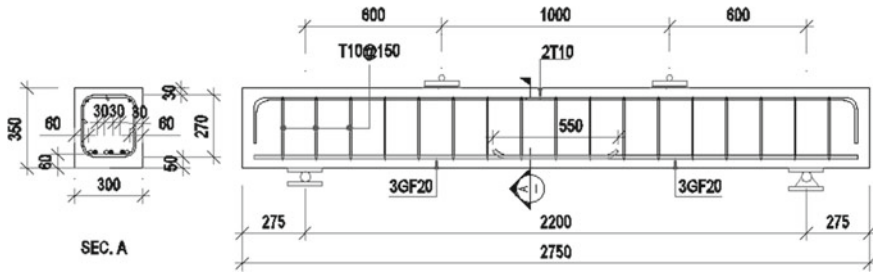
Reinforcement details of beam specimens with straight-end bar lap splices (SL-01 and SL-02)
